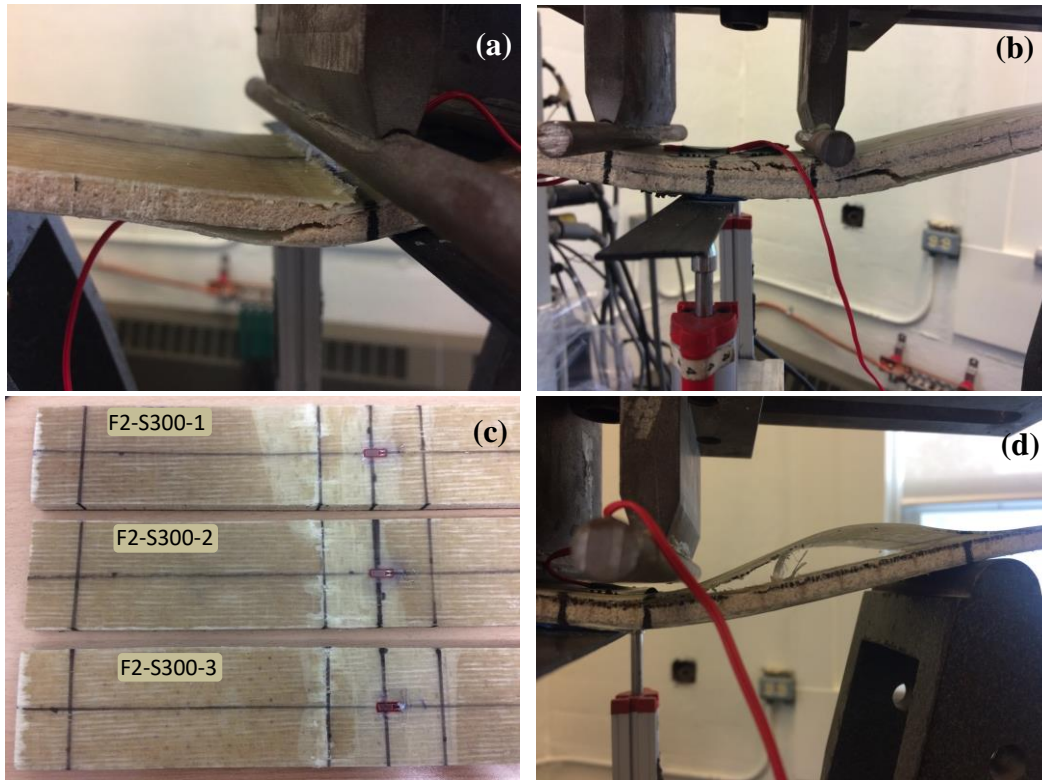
Failure modes: (a) core shear failure of F1-S200-3; (b) core shear failure of F2-G-S400-2; (c) top facesheet crushing failure of F2-S300; and (d) top facesheet crushing of F1-S200-2 followed with debonding and buckling.
